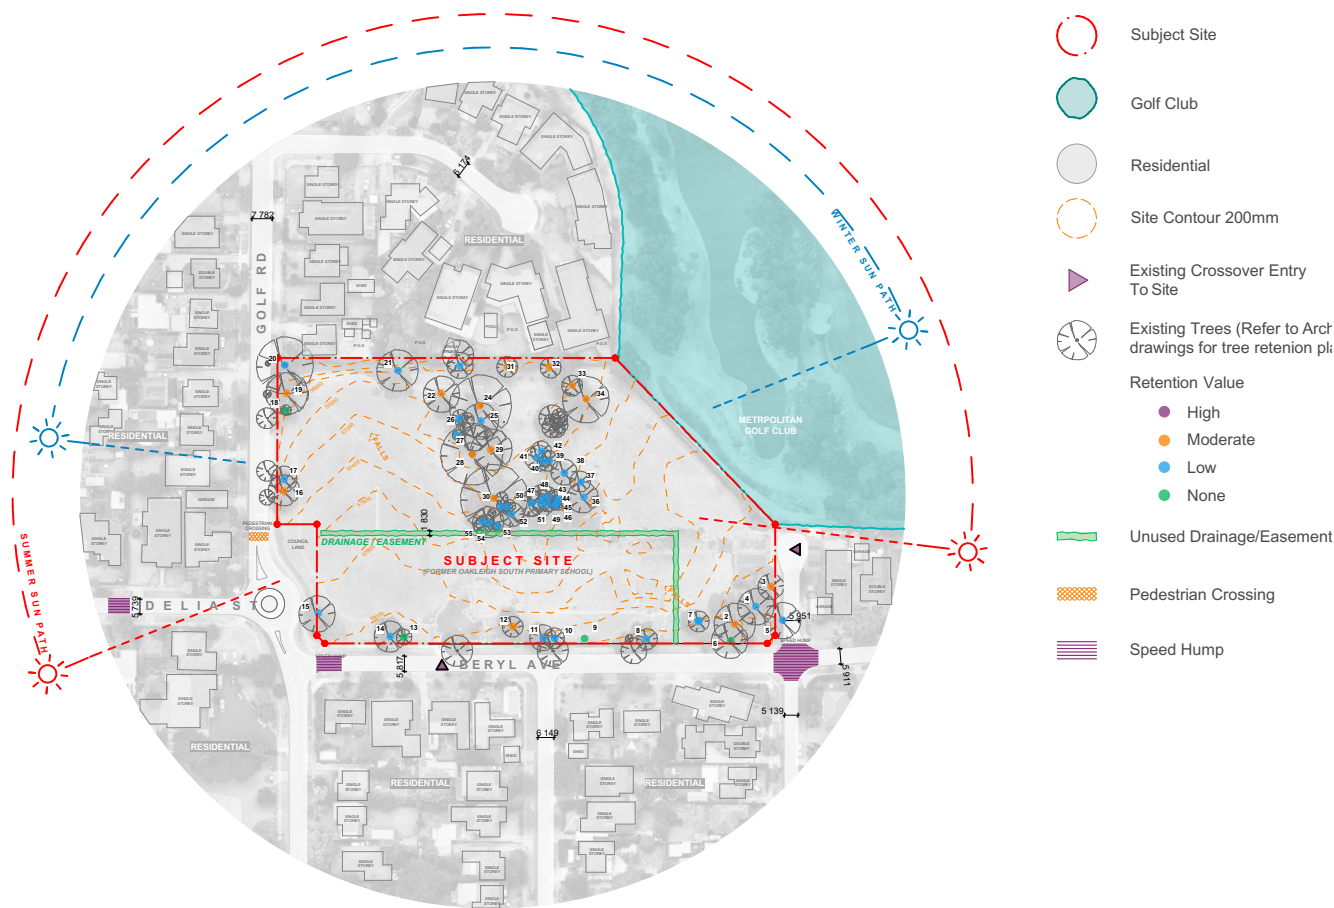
Site Analysis Plan (Source: Plus Architecture)
